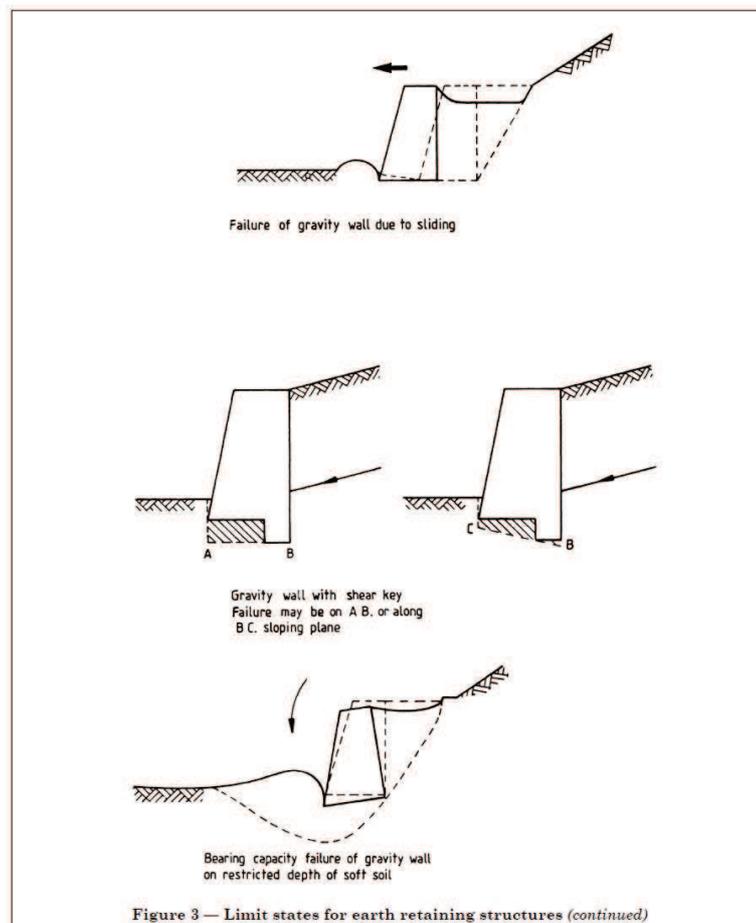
Retaining wall limit state: extract 2 from BS 8002:1994 [4]
